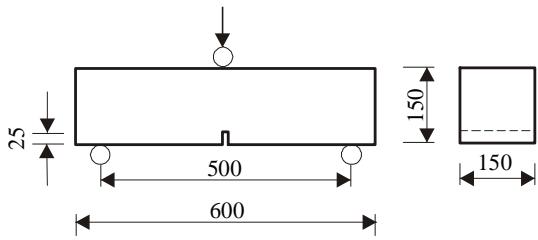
RILEM standard test for conventional fiber reinforced concrete
